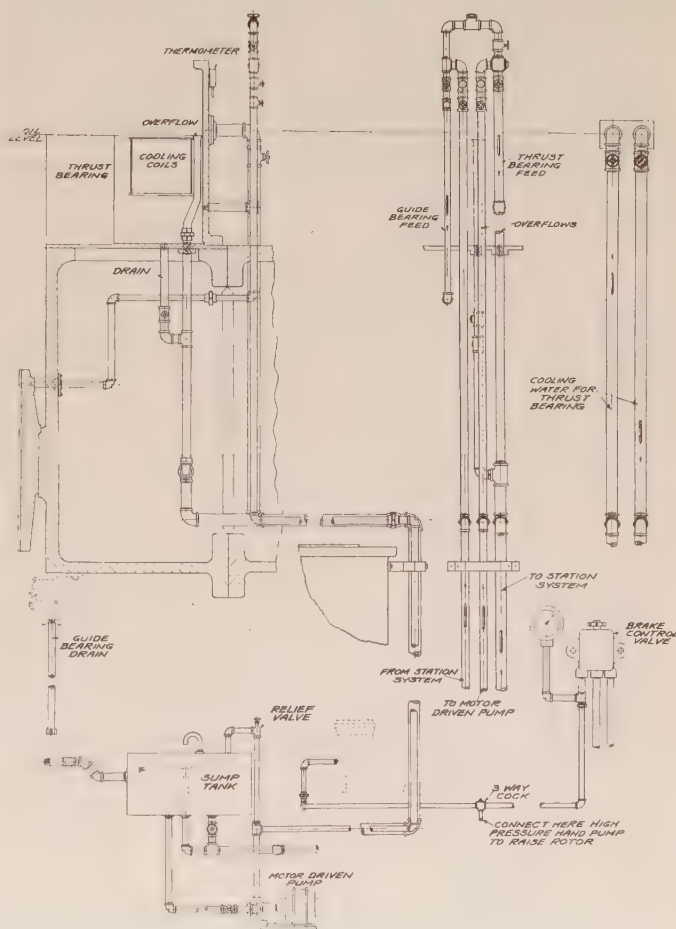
DIAGRAMMATIC PLAN OF PIPING
